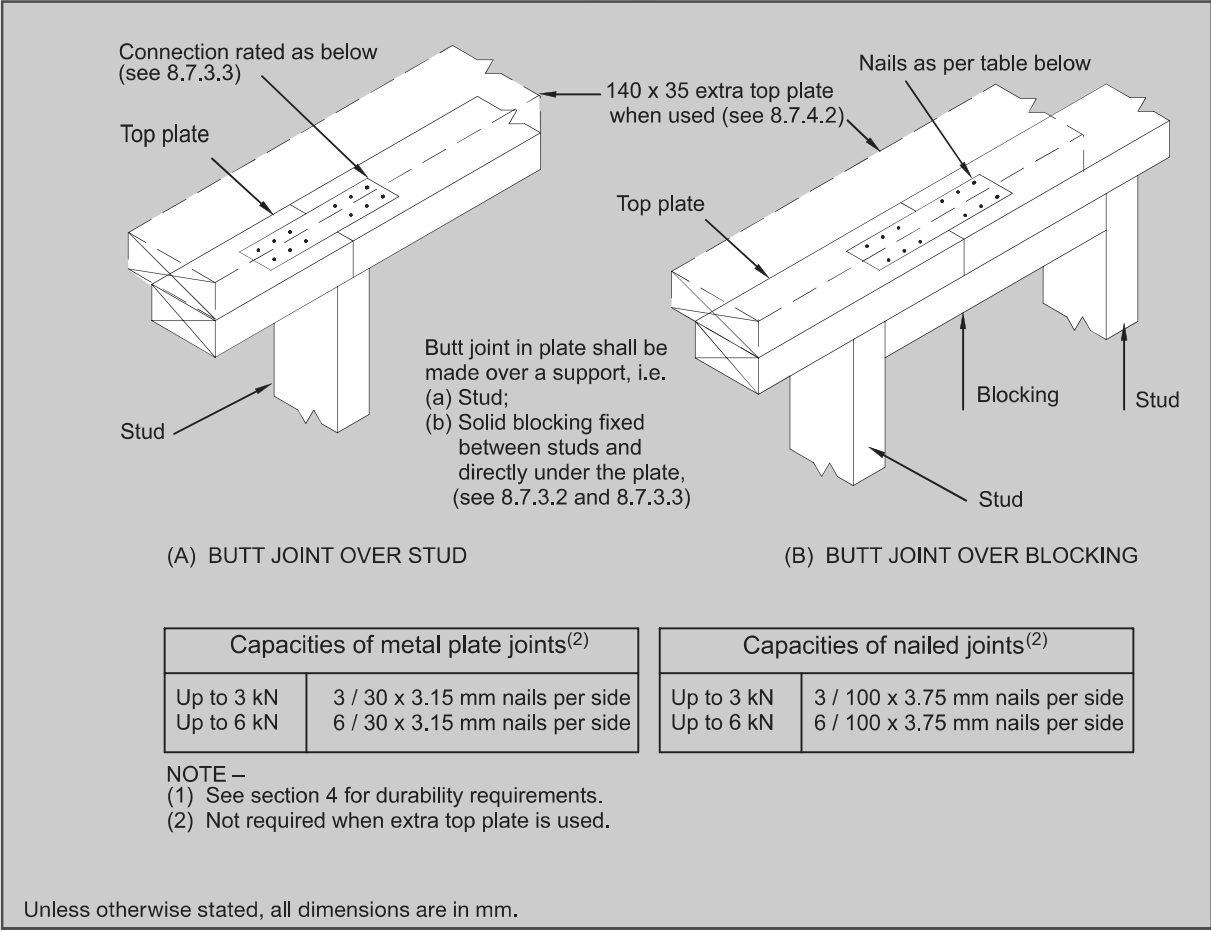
Connecting top plates in line – Walls containing bracing (see 8.7.3.3)
